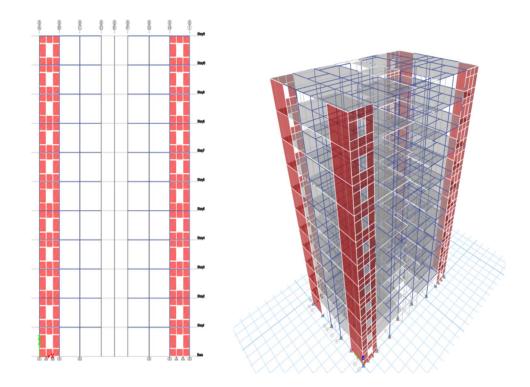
Two-dimensional and three-dimensional views of a multi-story construction with a perforated shear wall (pattern 3)
